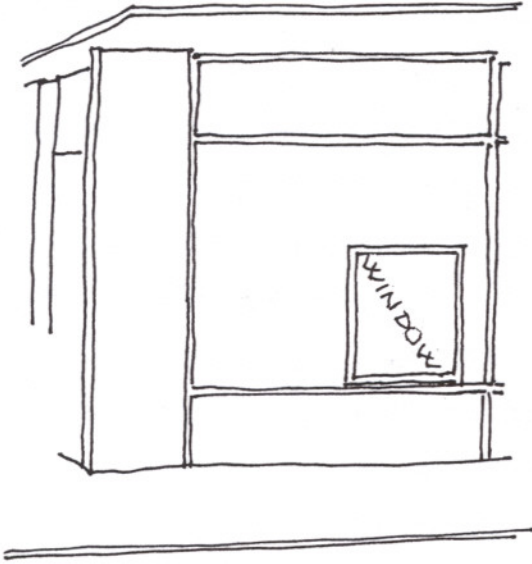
Window Sign (Source: <http://palm.act.gov.au/tplan/web>)
